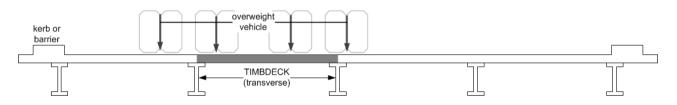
Typical bridge cross-section showing transverse timber deck arrangement
